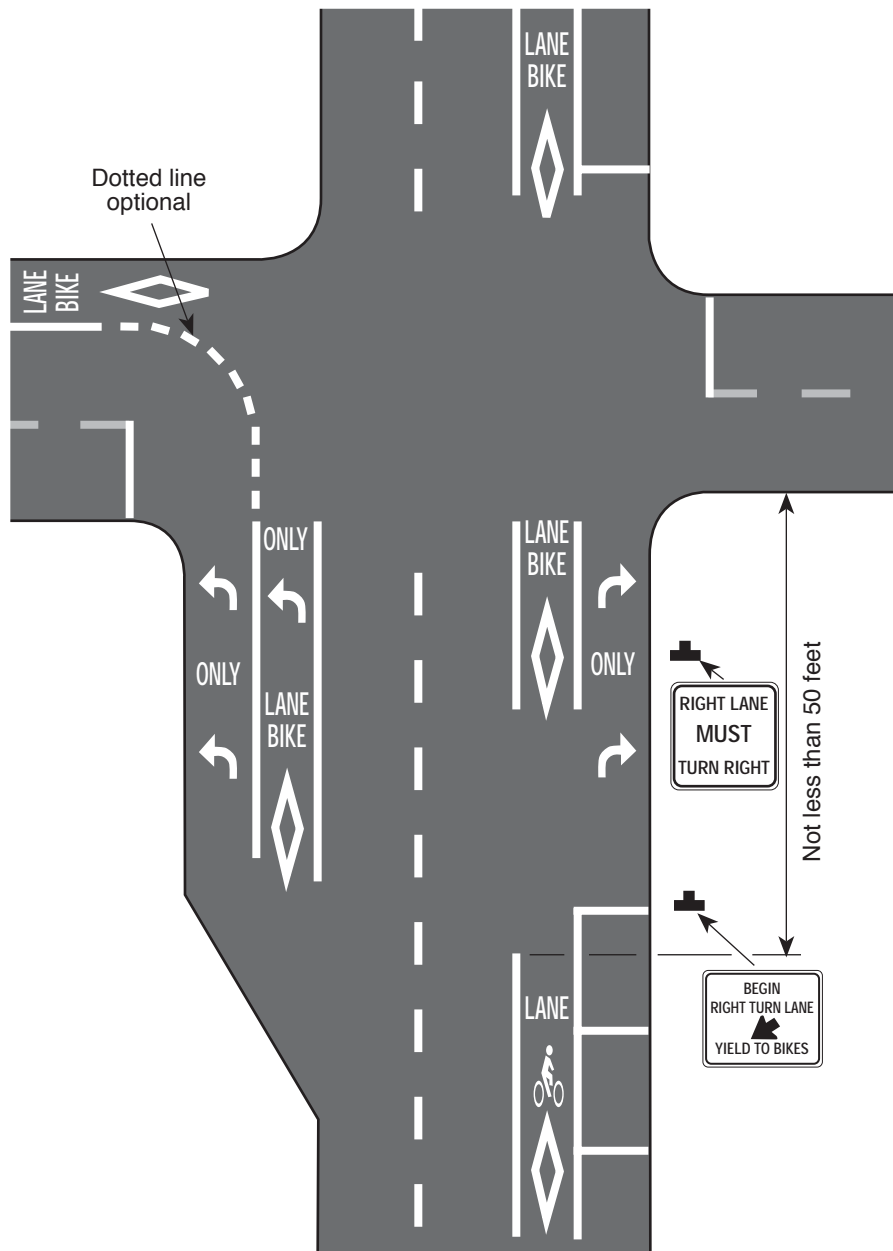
Intersection pavement markings — designated bicycle lane with left turn area, heavy turn volumes, parking, one-way traffic or divided roadway.
